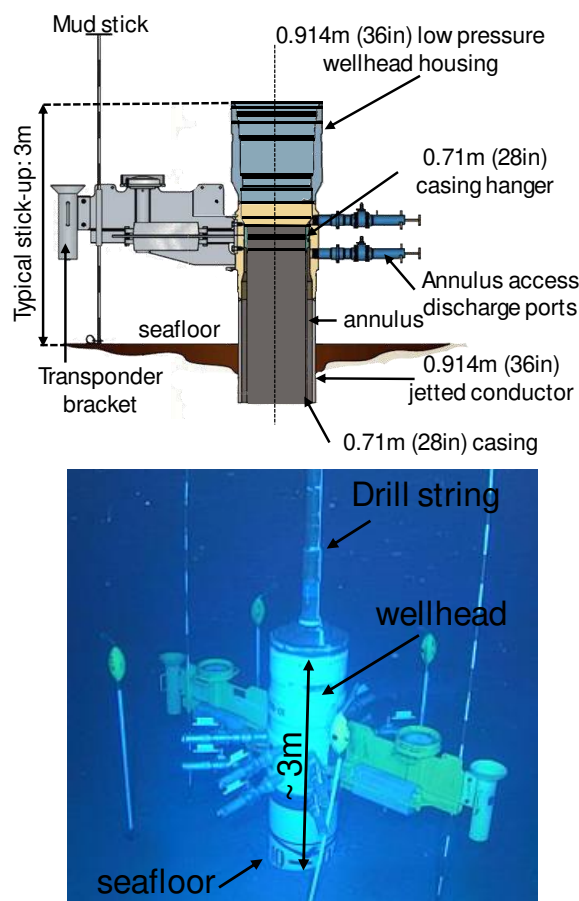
top) sketch and bottom) ROV view of typical deepwater open-hole wellhead system.
